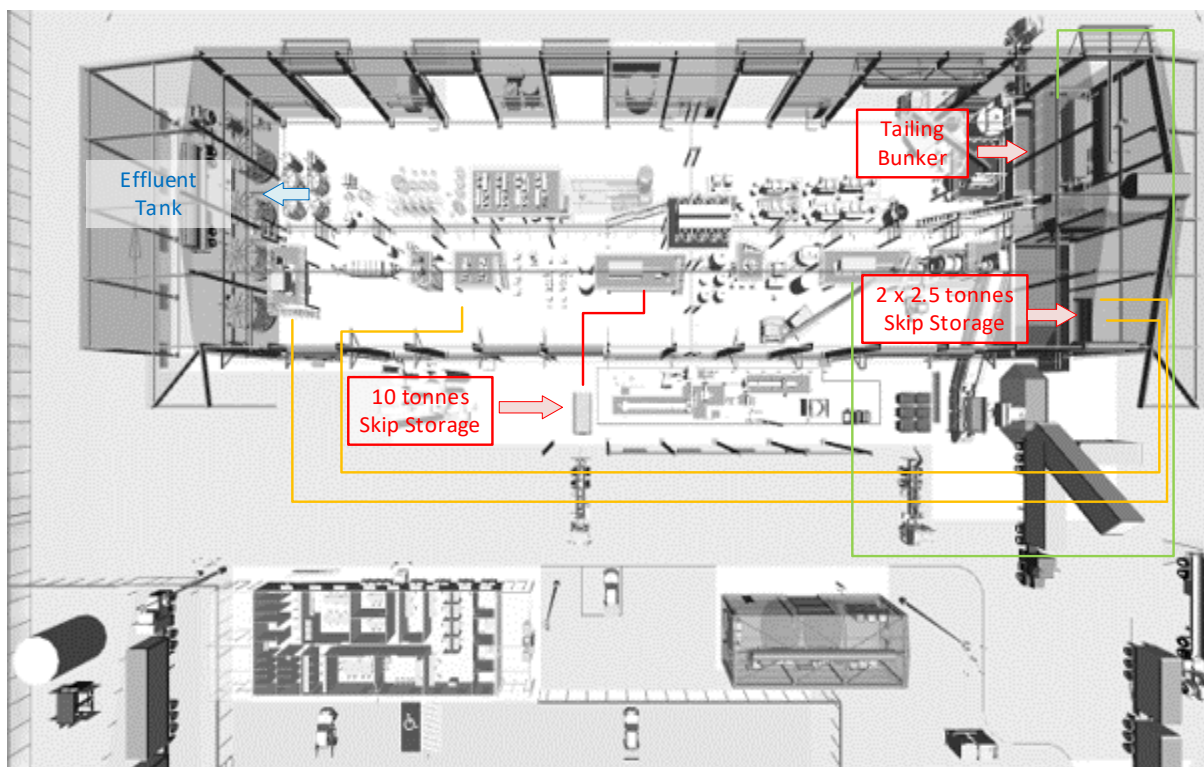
QRCUF Site Layout – On-Site Waste Movements
